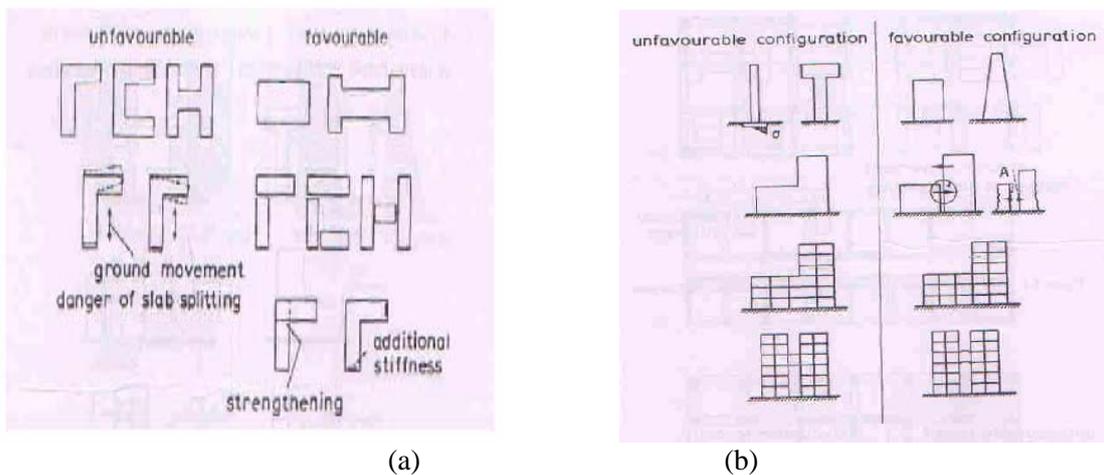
Unfavourable and Favourable Structural Plan (a) and Elevation (b).
